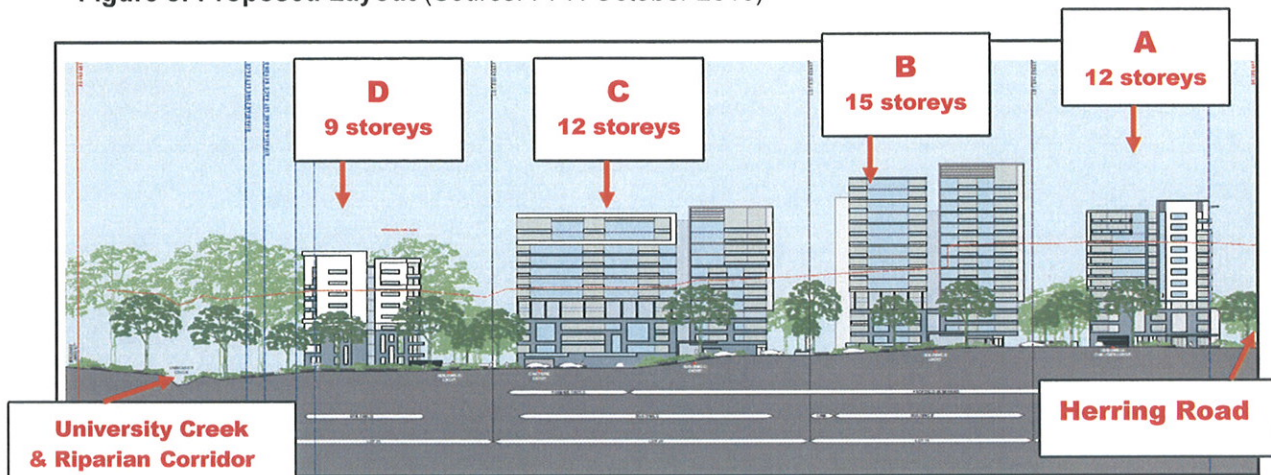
South west elevation & Site long section (Source: PPR October 2010)
